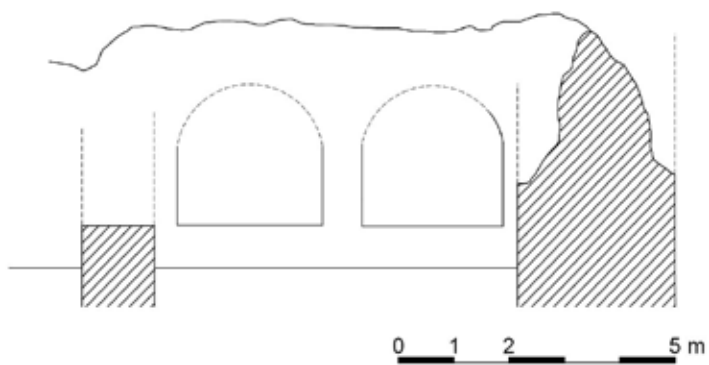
Layout of blank windowrecesses in the north wall of the building in the north-east corner of the castle at Stare Drawsko (drawing: K. Wroński, based on photo by B. Sańko, after T. Balcerzak, *Sondażowe badania...*)
